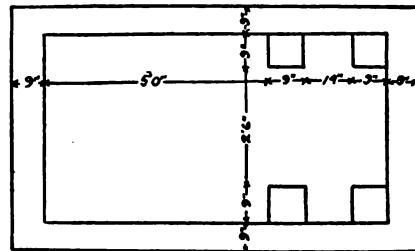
A FLOOR PLAN AND DIMENSIONS
